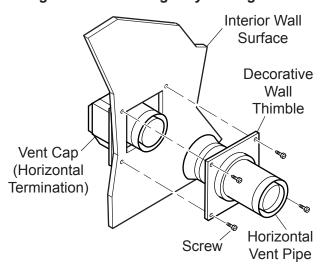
Connecting Vent Cap with Horizontal Vent Pipe
